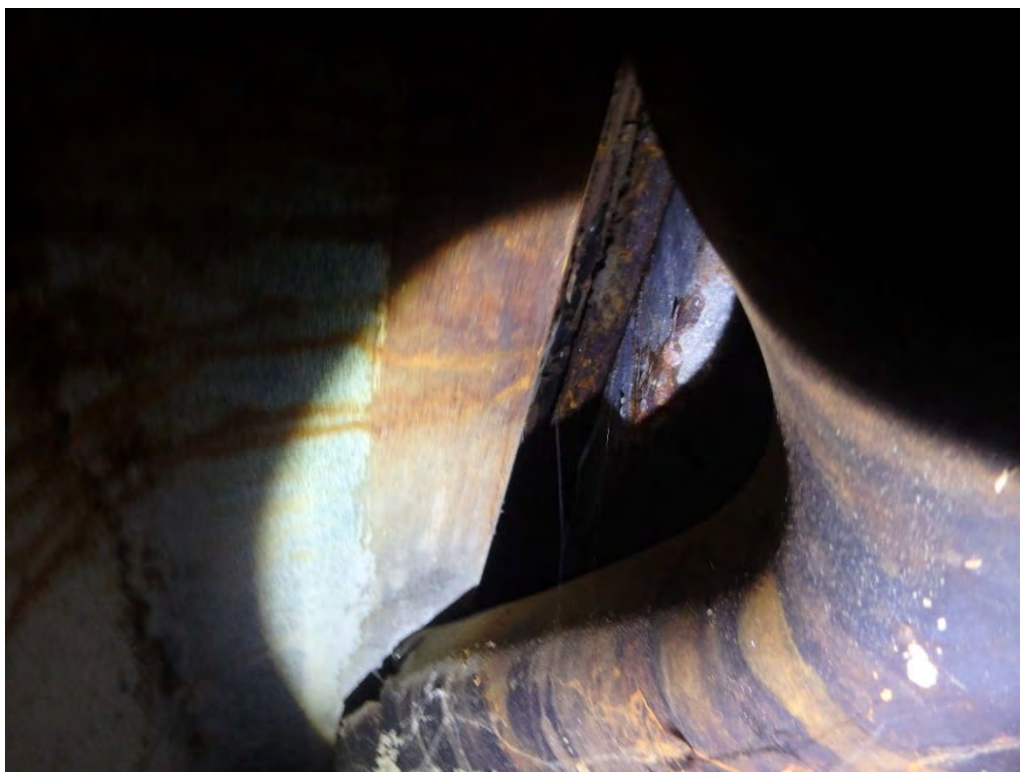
Seven Locks Road (106010) – Looking into space between abutment and deck above where possible bat guano was found
